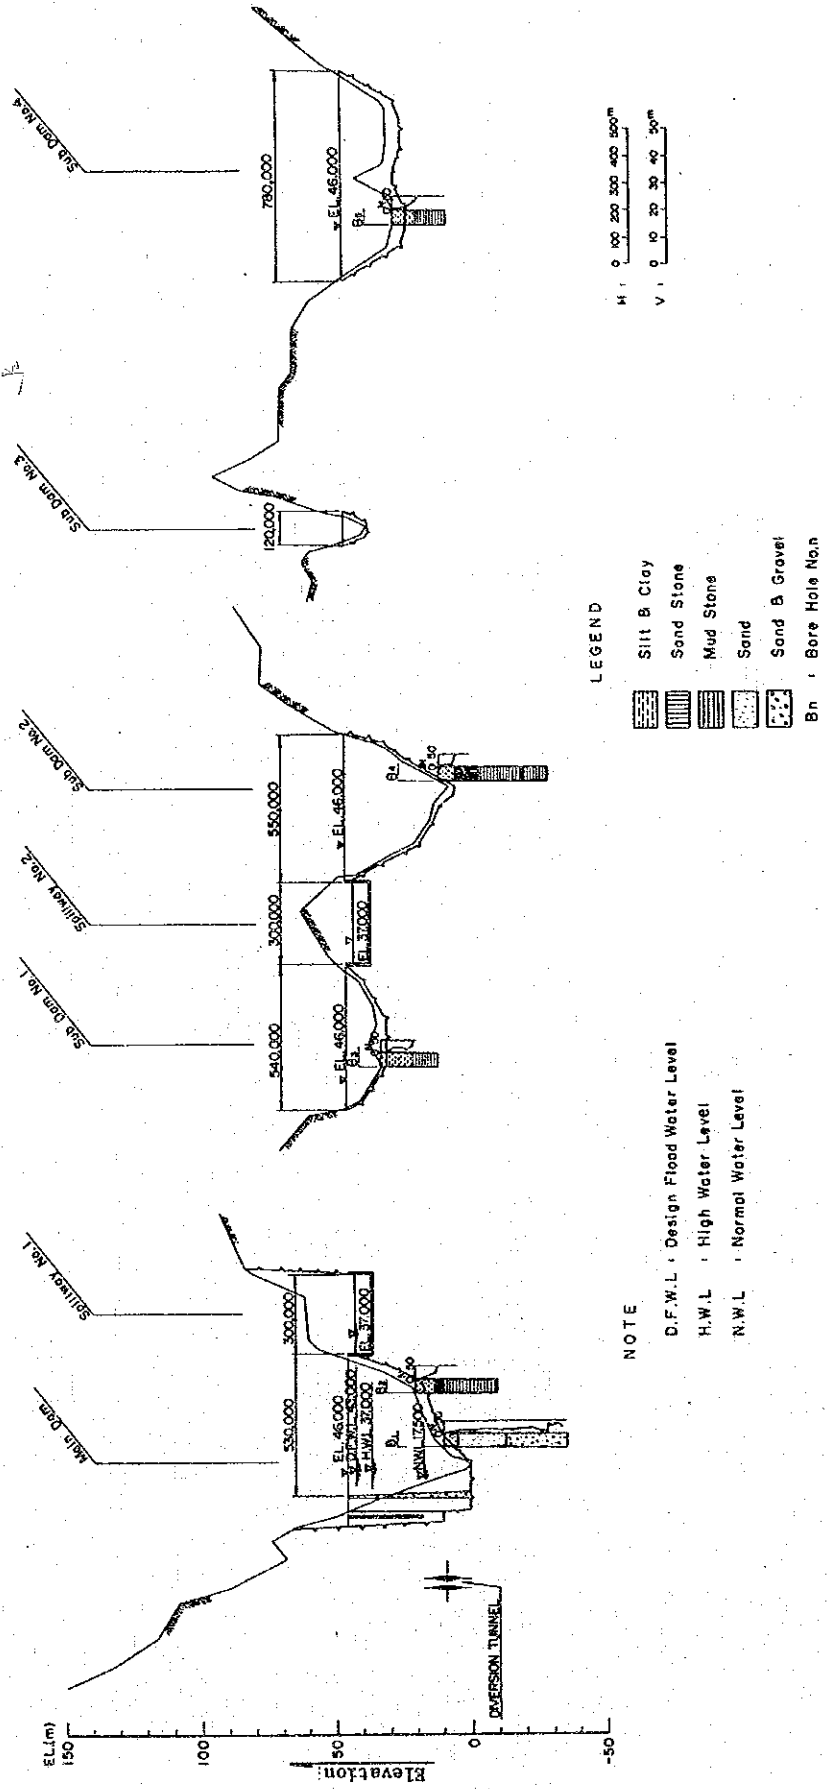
TYPICAL CROSS-SECTION OF DAM
